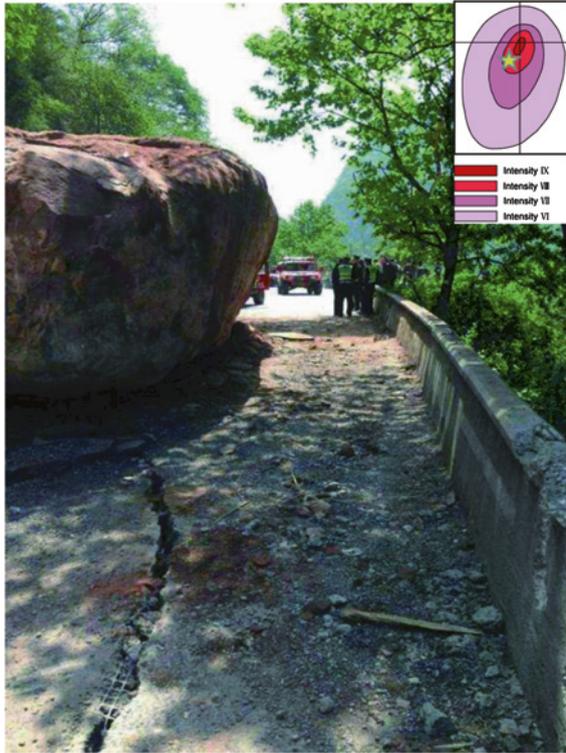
Road destroyed by a giant stone at province road S210 near Feixianguan Town
